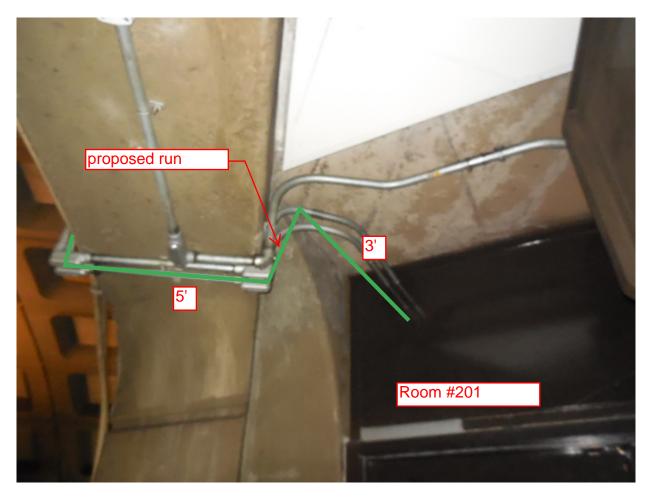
A03 Dupont Circle South: Proposed overhead conduit on other side of door for room #201
